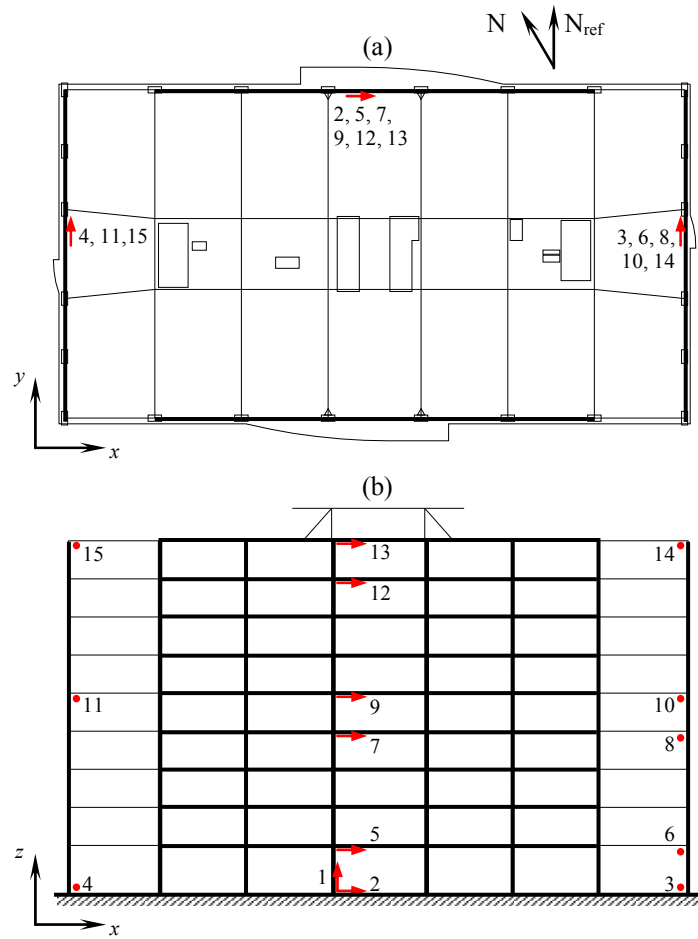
Locations of sensors in the 9-story symmetric-plan building: (a) plan view, and (b) south elevation.
